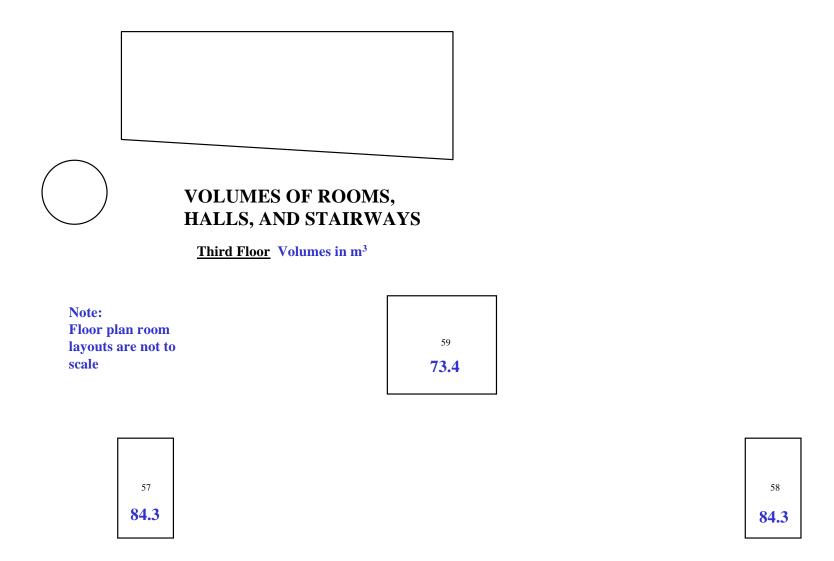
Volumes of Rooms, Halls, and Stairways on the Third Floor
